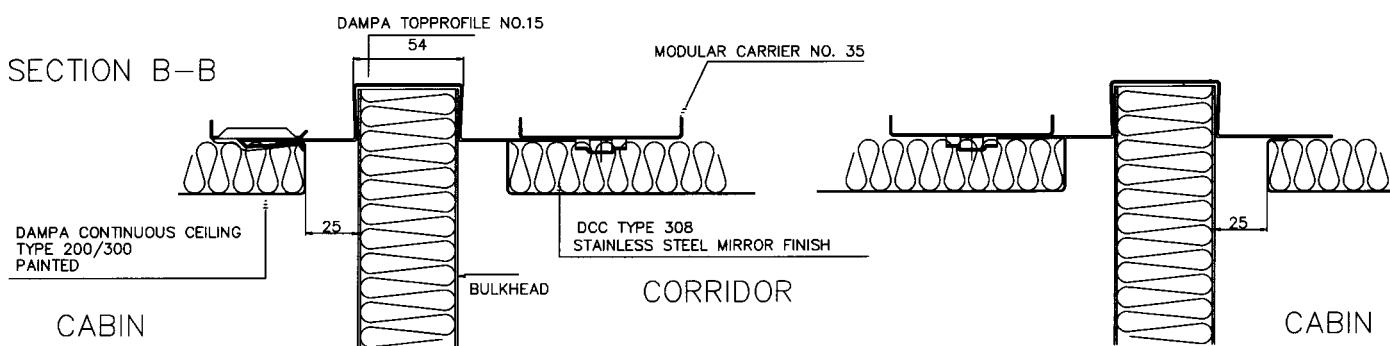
(a) Typical Joiner Linings and Ceiling Details—Ceiling details (DAMPA)
